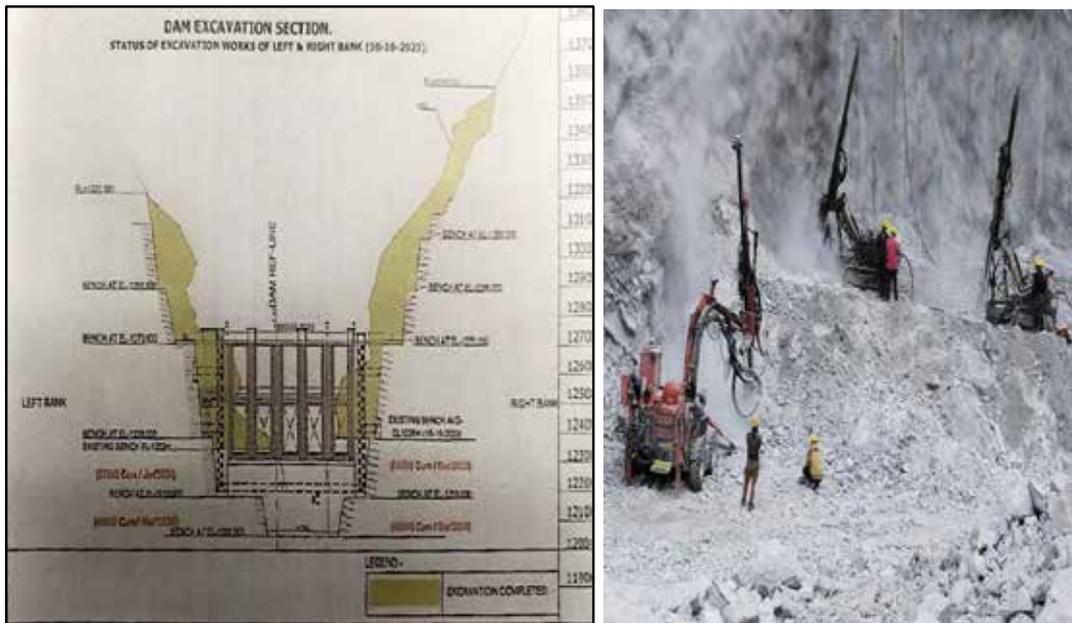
Showing excavation steps from El 1342 m to El 1238 m
